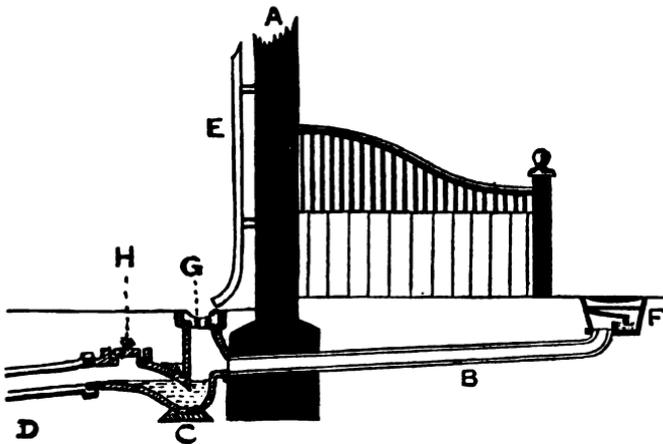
Ventilation of stable drains. F, stable trap; B, stable pipe; C, disconnecting syphon; D, sewer pipe; E, water pipe from roof opening over G, grating covering fresh air inlet; H, access opening.
